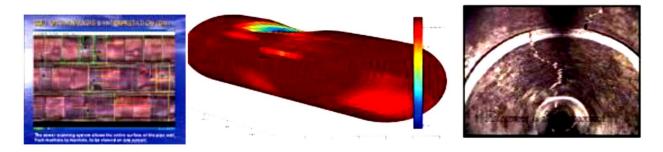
Structural damage and longitudinal cracked condition of the sewer
